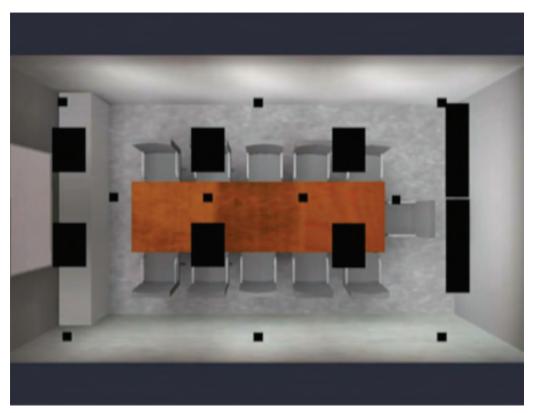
Fixture layout. Room is 23' 3" x 12' 10" with 8' ceilings.
